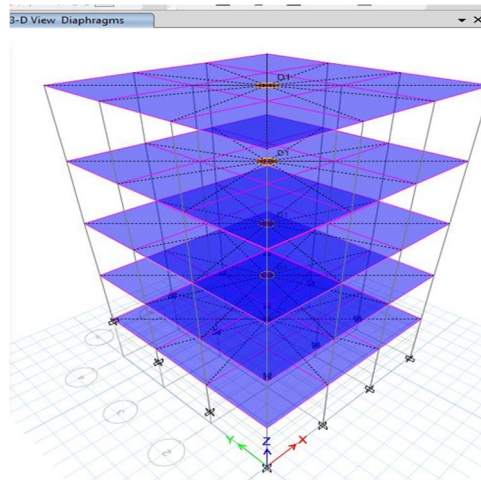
Model 1: G+4 Building Without Bracings at 20° Slope
